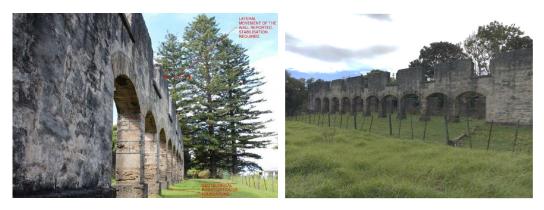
(left) – Longridge Barracks Arches showing thickness of wall [Source: GML] and Figure 8 (right) – Colonnade wall of Longridge Barracks Arches [Source: AECOM]
